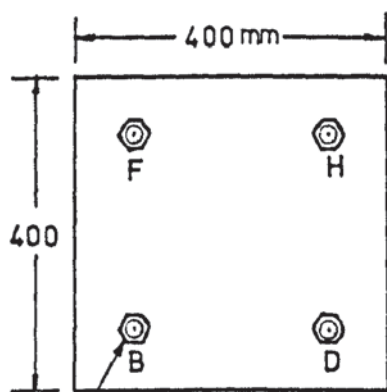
GAUGE LOCATIONS AND LOADING POINTS ON CULVERT
